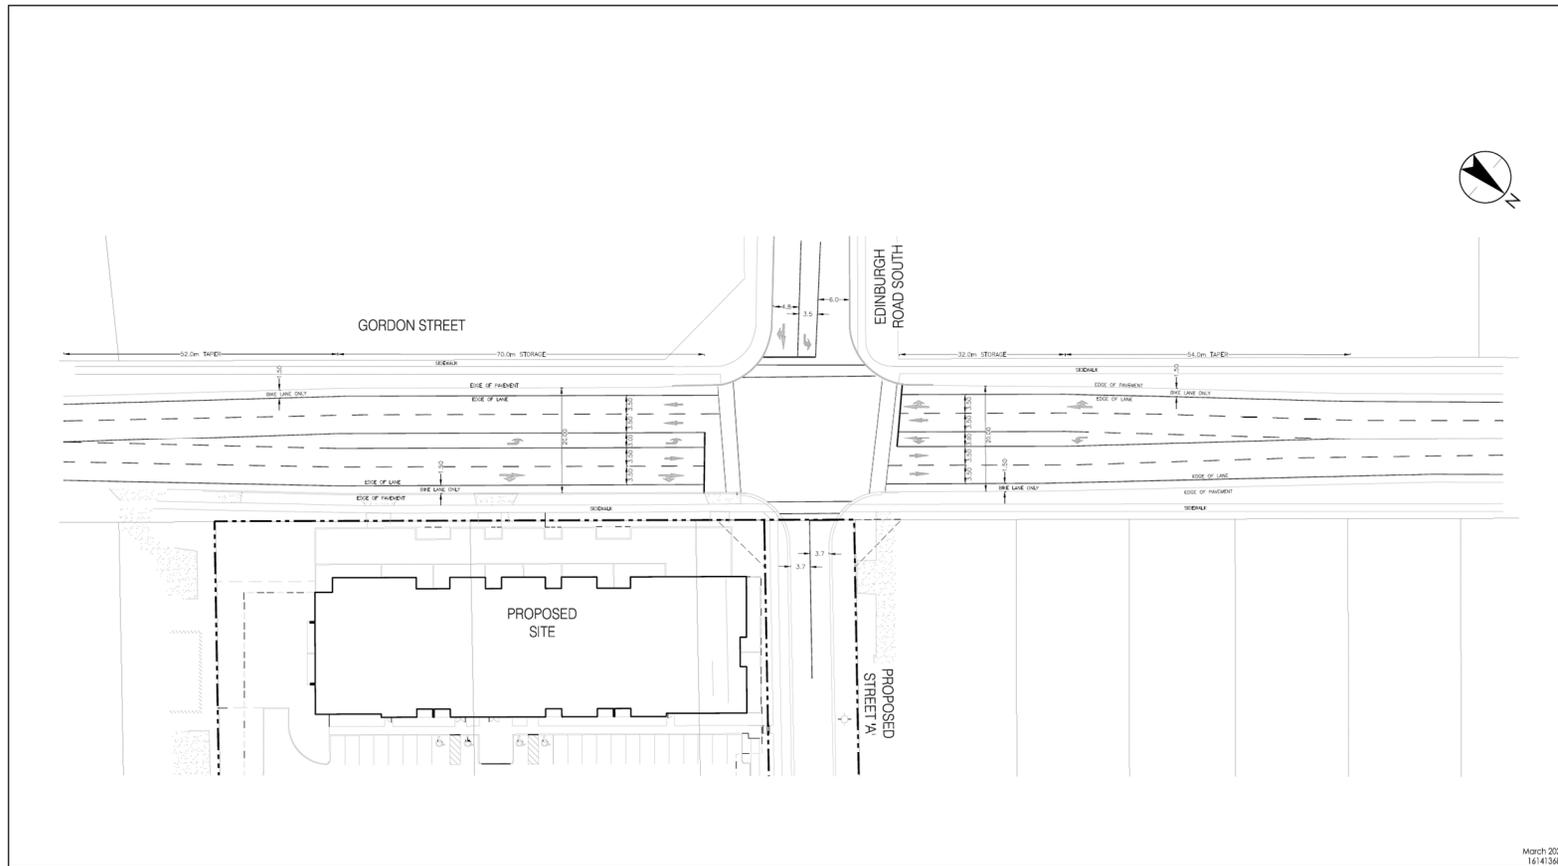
Gordon Street / Edinburgh Road Concept Plan
